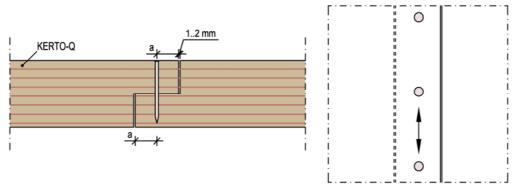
Joint with half lap, for minimum spacing see chapter 10.1.1.
